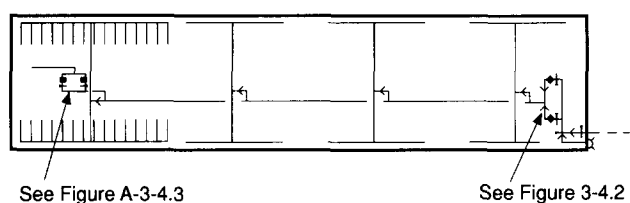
Typical piping layout for combined dry pipe and preaction sprinkler system.
